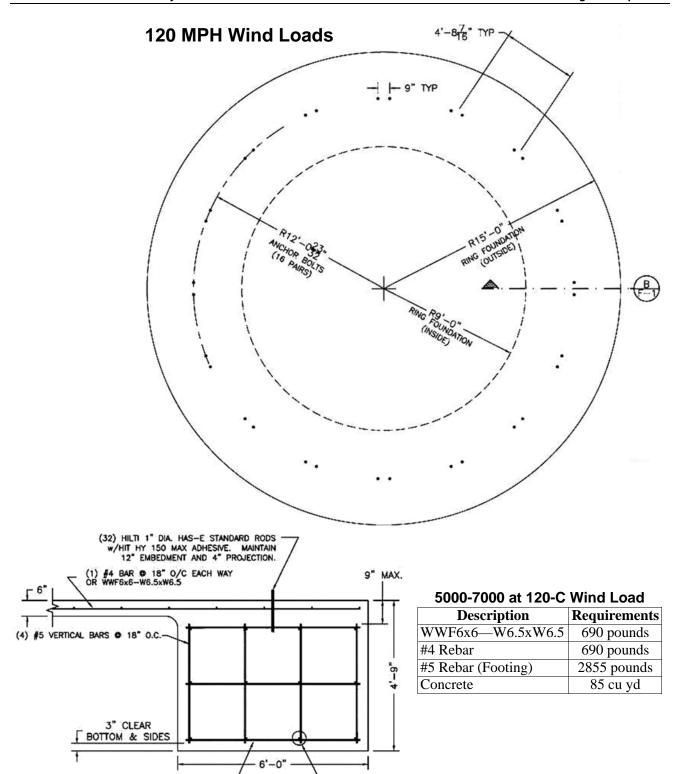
5000-7000 BCT Foundation at 120-C Wind Load
